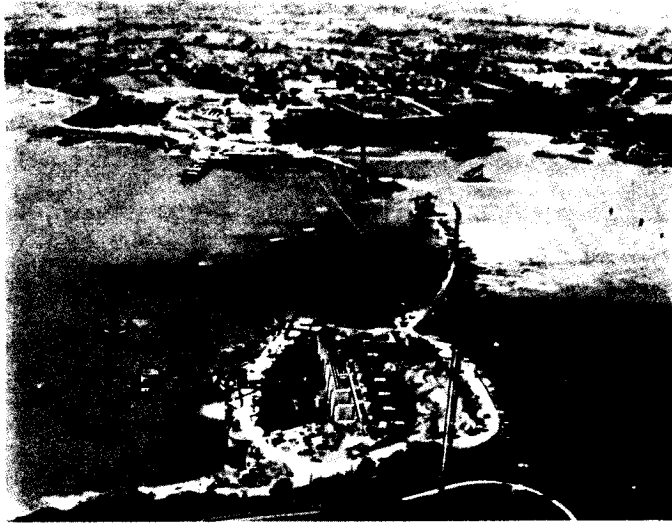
Sluicing ebb discharges after installation of 11 columns in north cofferdam (Oct. 14, 1962). (Photo: EDF)
